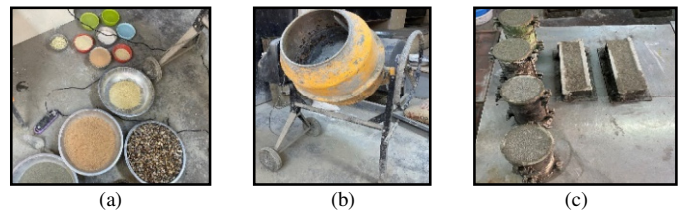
Sample preparation techniques: (a) material preparation, (b) mixer, (c) method of compaction for cylinder mold and prism mold.
